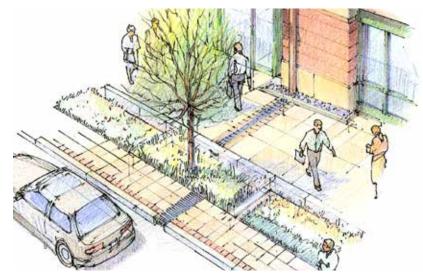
Sketch showing roof runoff channeled to infiltration pits at street.
